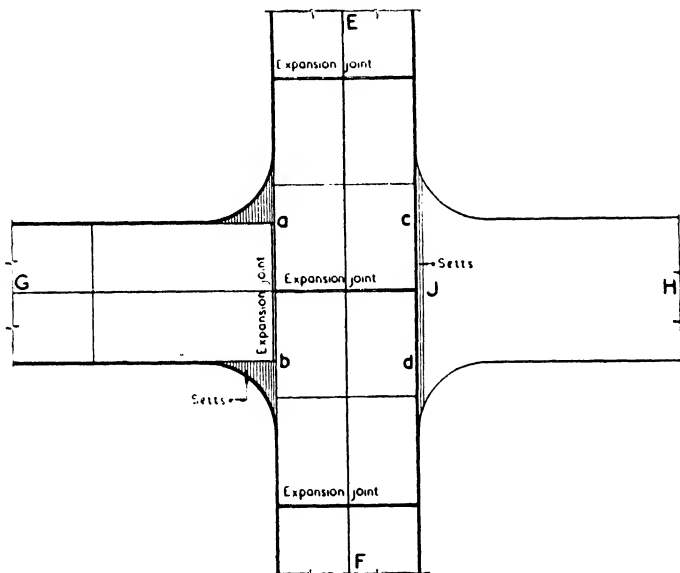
JOINT BETWEEN CONCRETE AND OTHER SURFACING.
